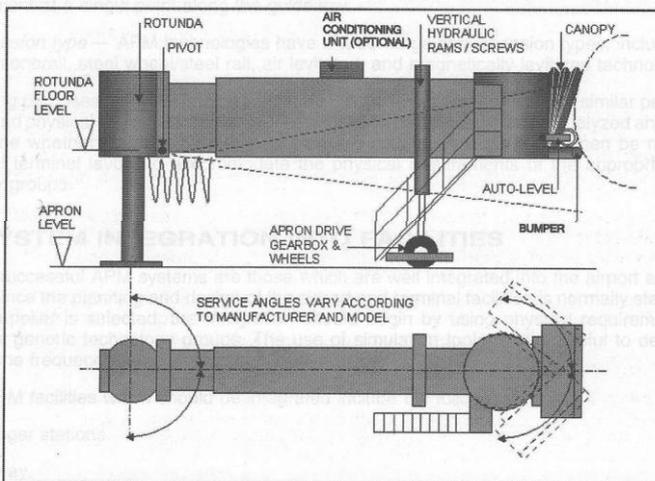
Typical sections of apron drive passenger boarding bridge
